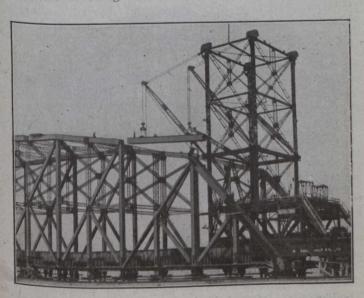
Travelle Placing Final Section of Top Chord of New Suspended Span
